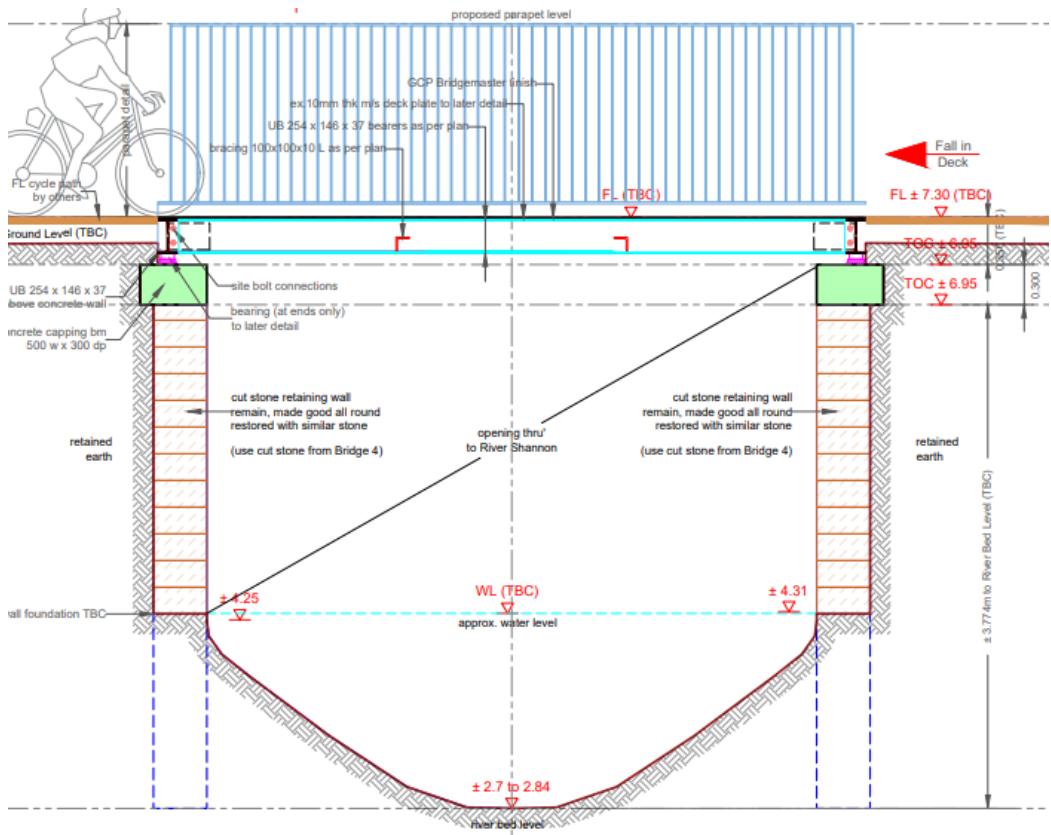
Proposed deck replacement for Bridge 3 with new concrete plinths on existing stone abutments
